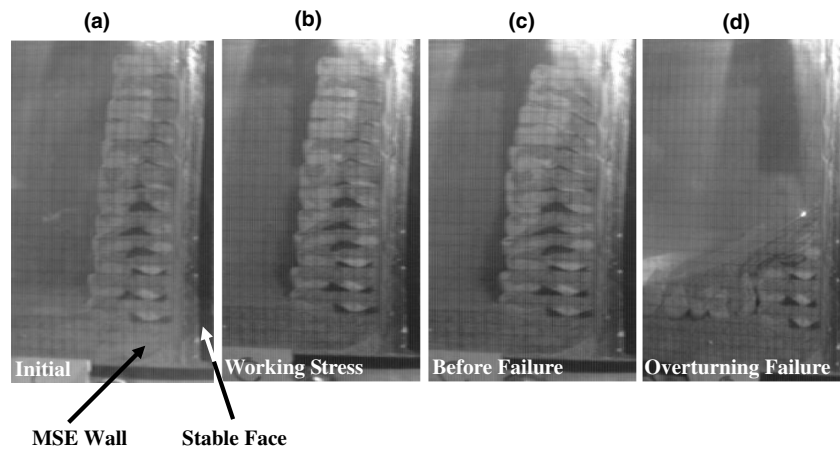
Photographic images from centrifuge: (a) initial condition (1 g); (b) working stress (10 g); (c) right before failure (32 g); (d) failure condition (32 g)
